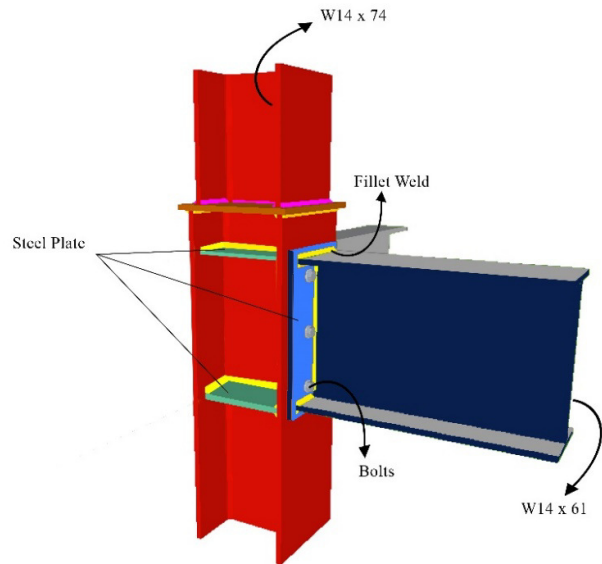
Welds and Beam Connection between Column and Beam
